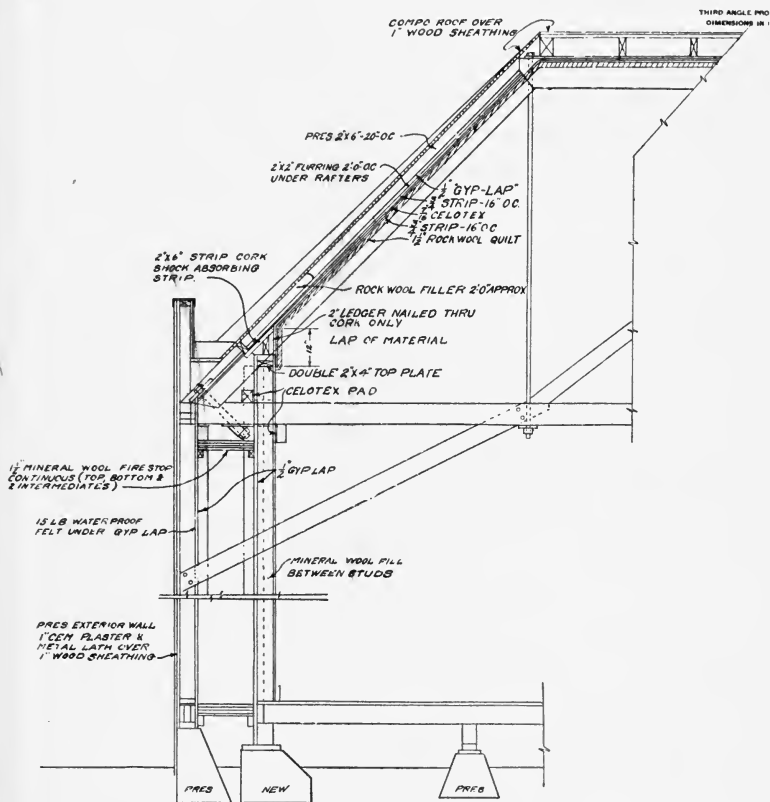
Structural details of typical exterior wall and ceiling of sound proof construction.
